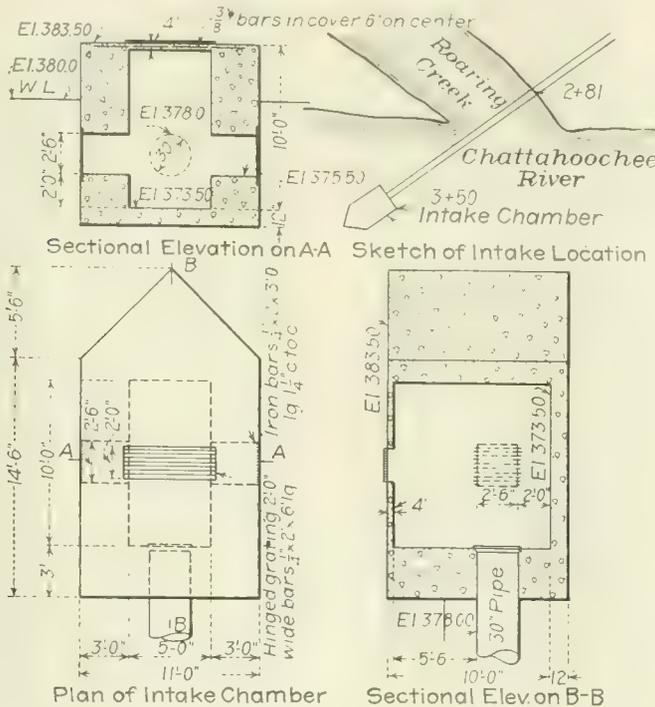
Details of Intake Crib of Proposed New Water Supply, Columbus, Ga.
